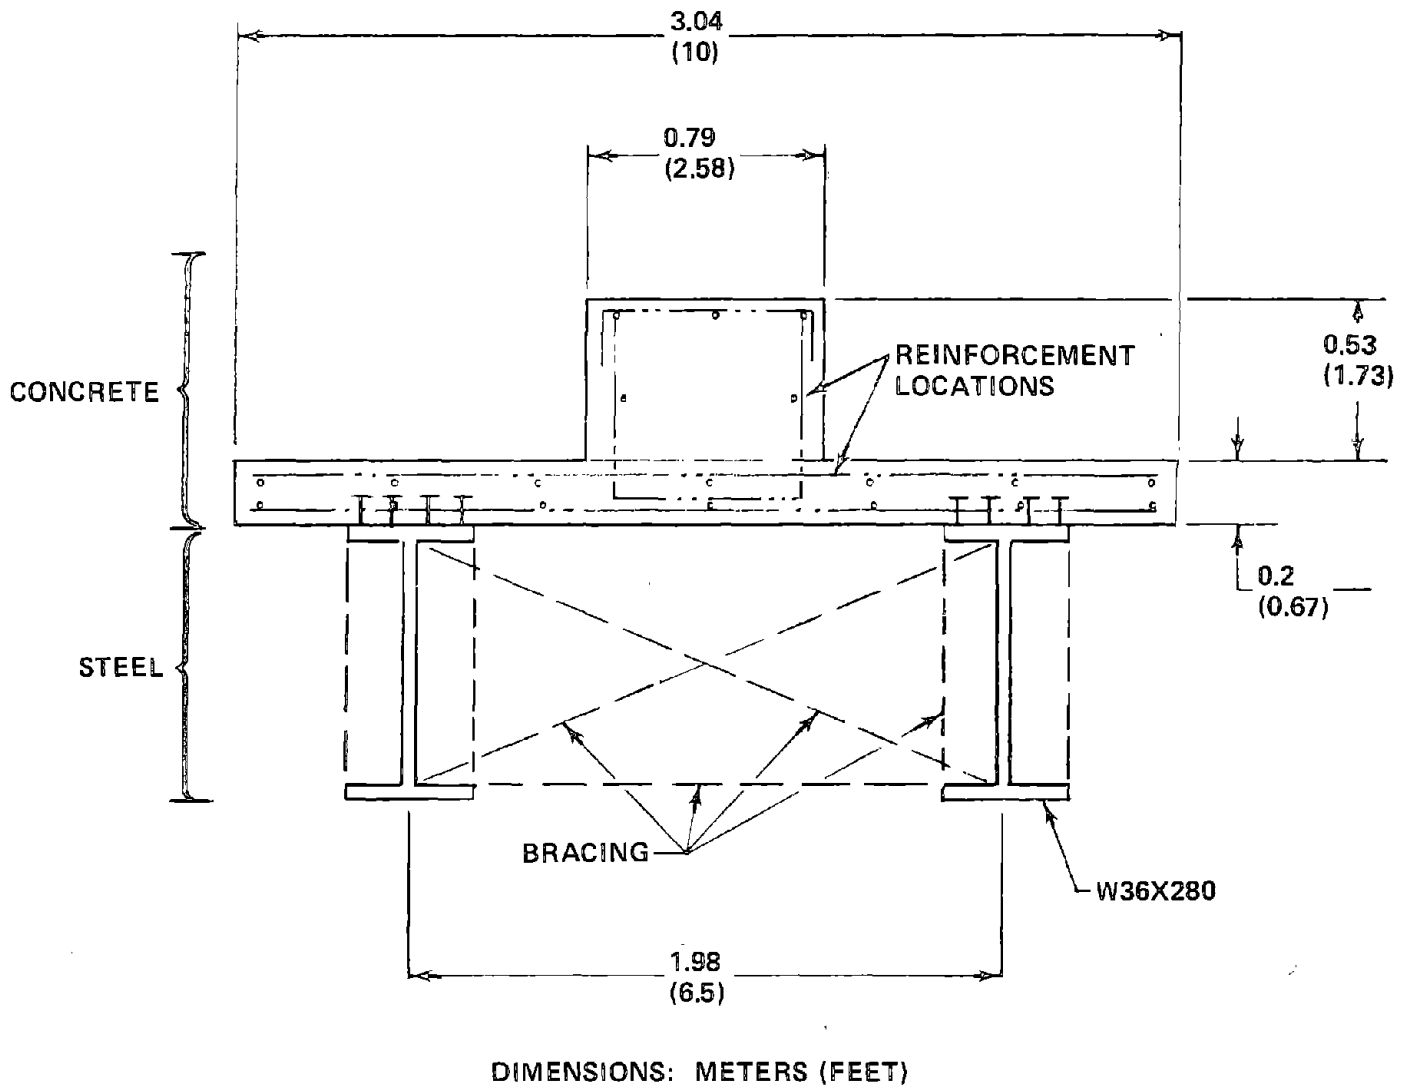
TYPICAL 22.8 M (75 FT) SPAN-COMPOSITE GIRDER
